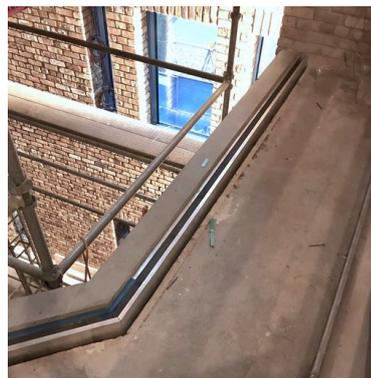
Aluminum 'shoe' which will later receive the glass handrail. Note it is butted up against the site-cast, smooth-finish architectural concrete balcony edge. It will later receive stone up to the opposite side.
